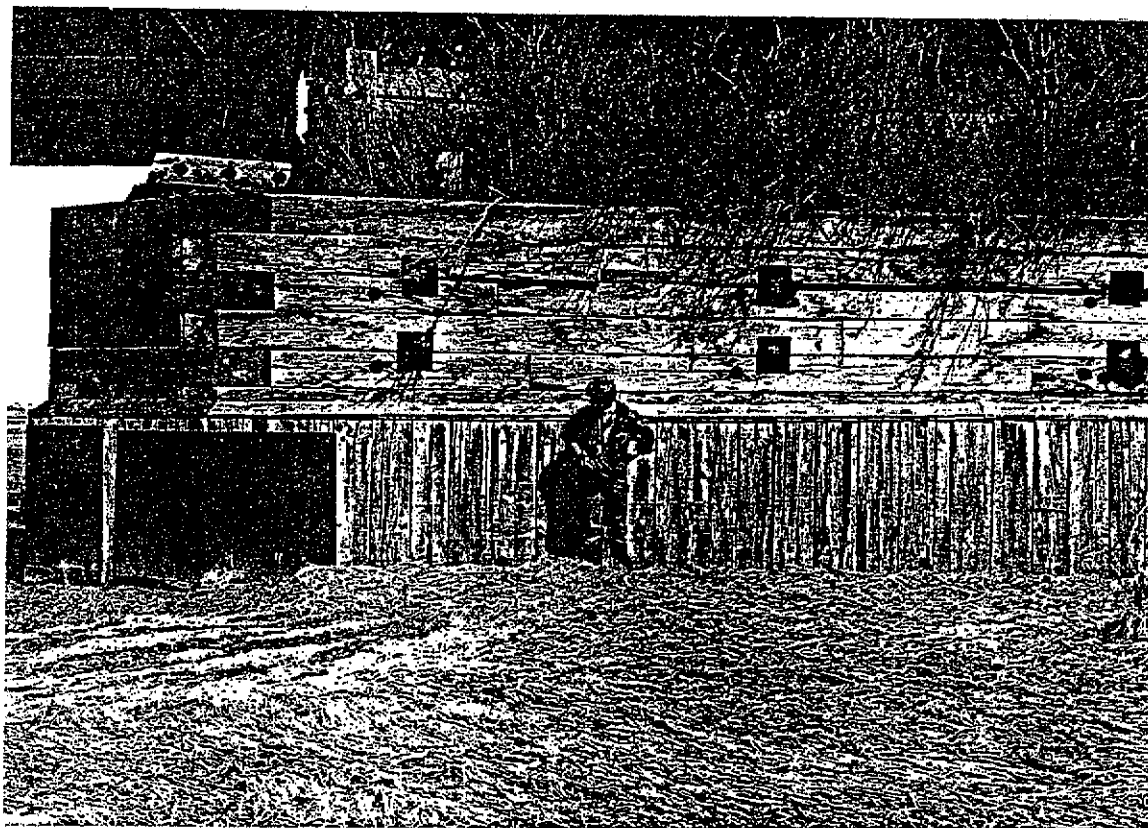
Upstream face of Pier 2 of railway bridge, 1990.
